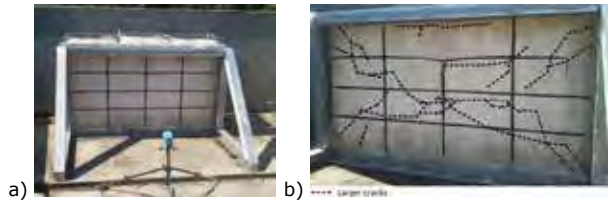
Structural element testing: a) out-of-plane setup for walls under blast loading; b) URM wall under WBWG loading
